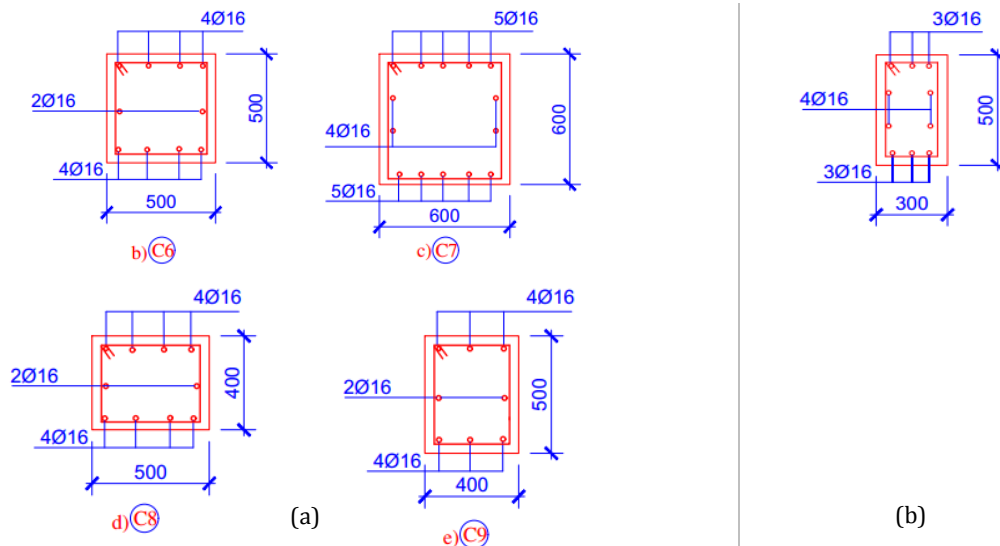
(a) Column and, (b) Beam reinforcement details for 6-story frame (units in mm).
